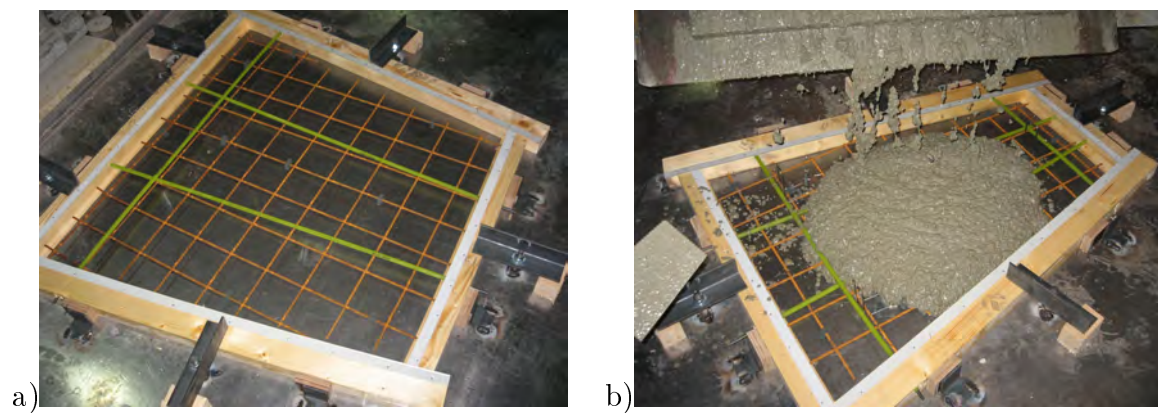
Precast concrete element - mold, reinforcement and ducts a) prior to and b) during casting
